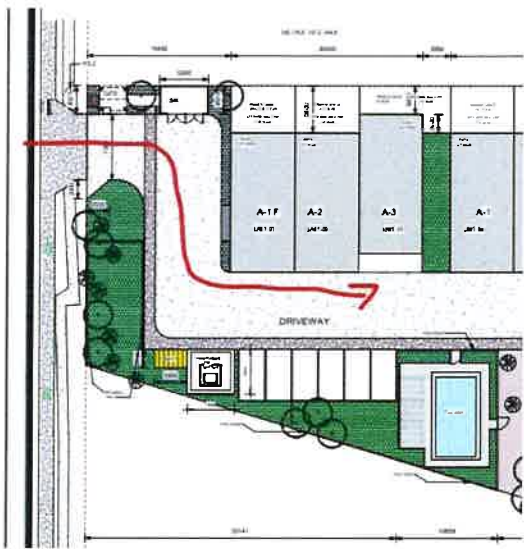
Extract from the applicant's revised site plan showing the driveway access on Landis Street at the northwestern corner, immediately adjacent to the 67 Landis Street boundary.
